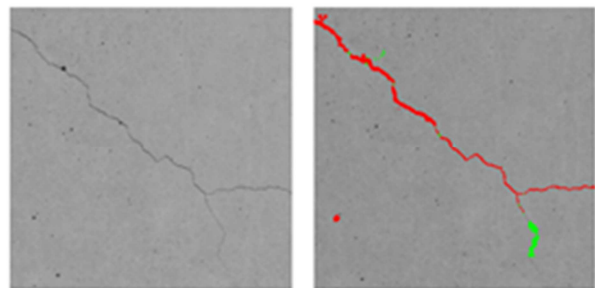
Digital image processing of concrete wall surface image showing a crack
